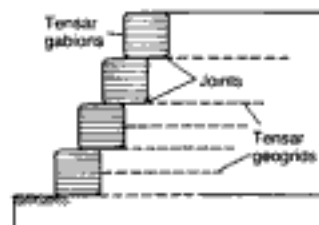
Tailed gabion wall constructed with Tensar polymer grid cages and Tensar geogrid tails to form a Reinforced Earth structure (courtesy of Netlon)
